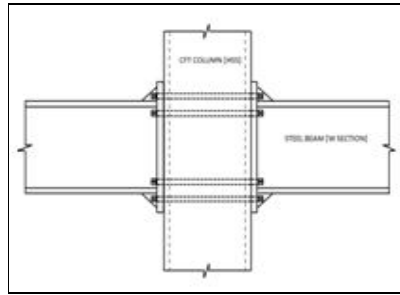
Schematic of typical CFT Column and Steel Beam Composite System
